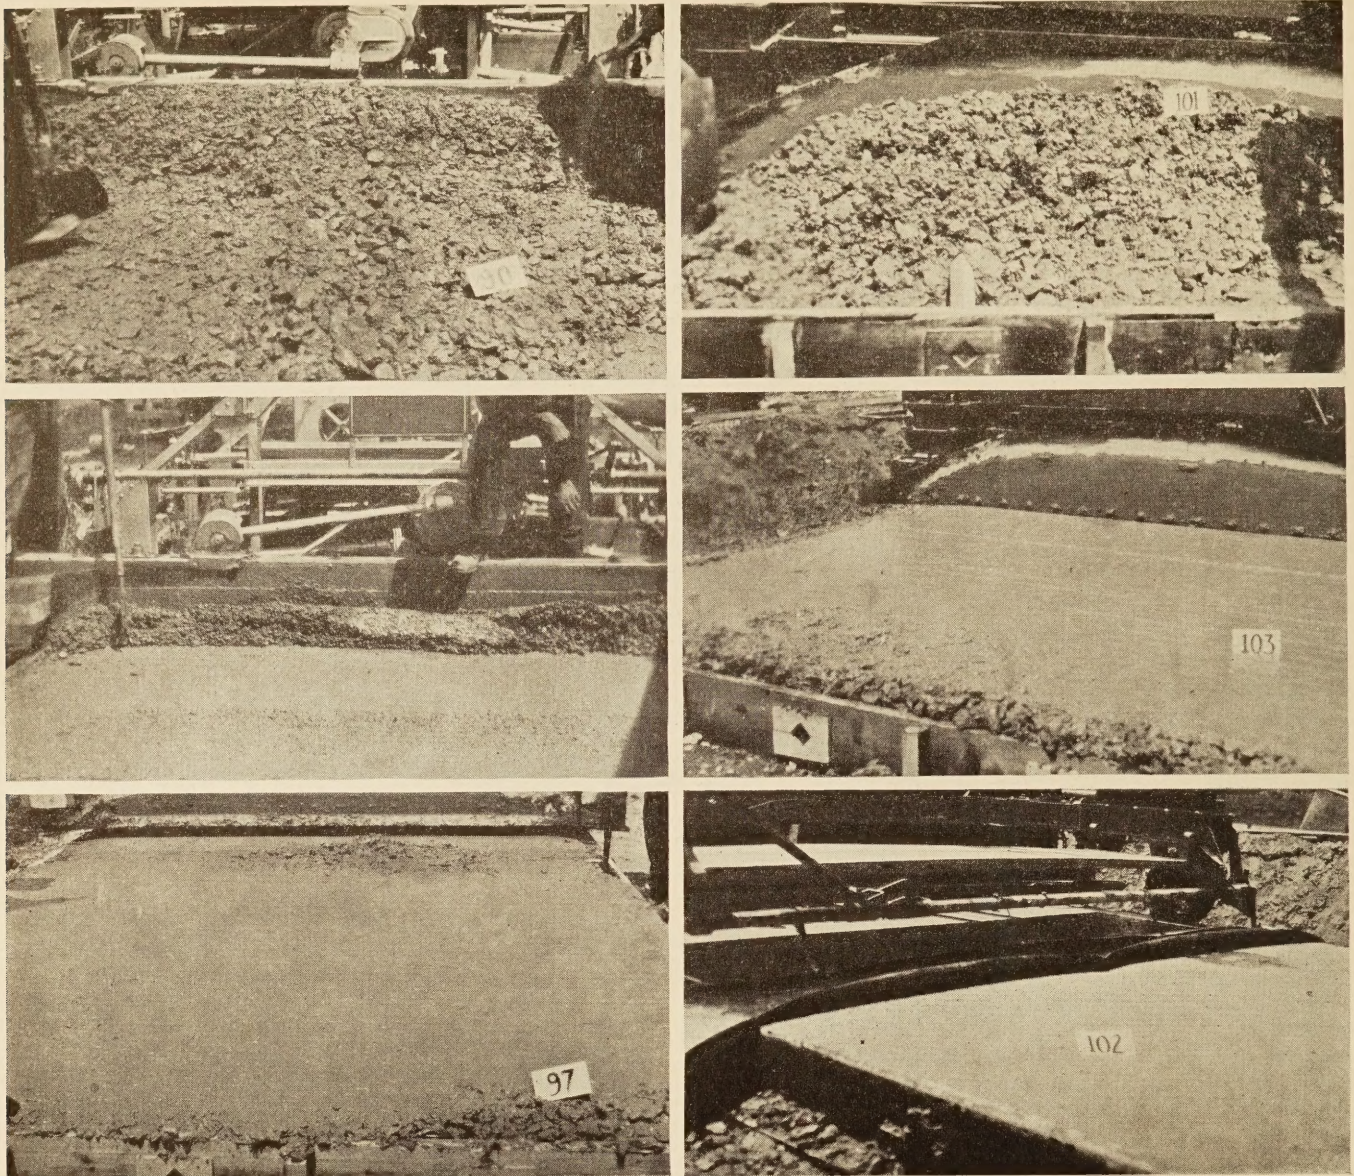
TYPICAL APPEARANCE OF FINISHED SECTIONS. TOP, TYPE A FINISHER; BOTTOM, TYPE C FINISHER
